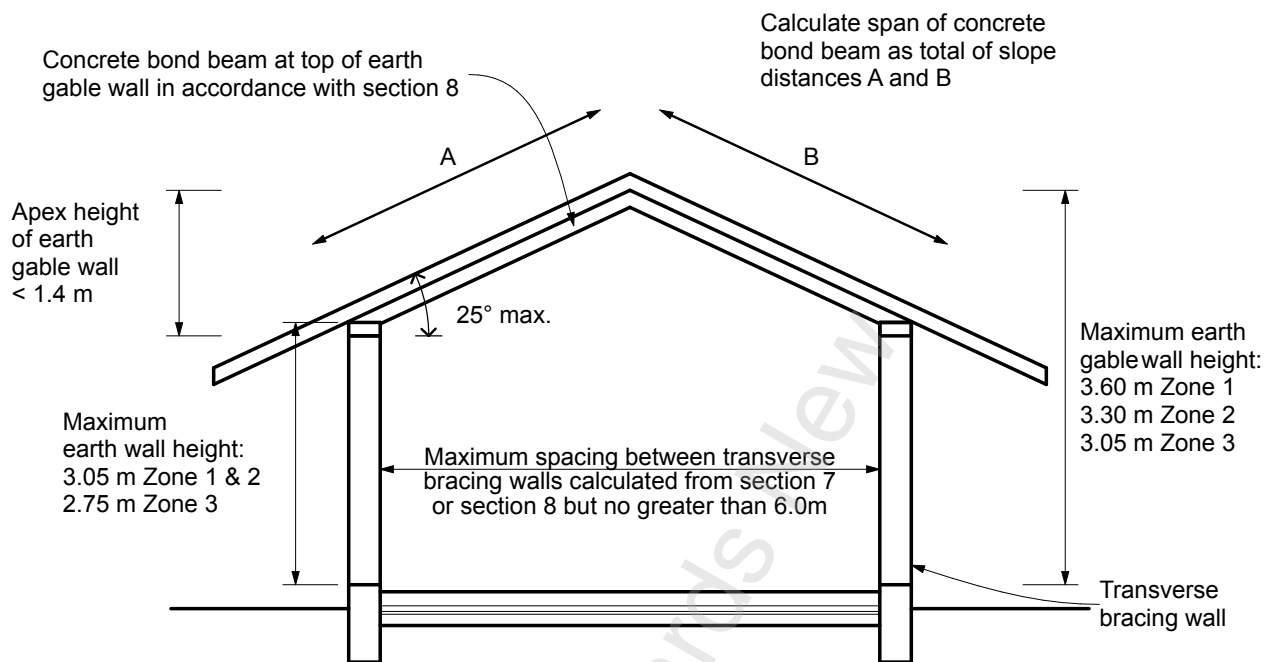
Concrete bond beam at top of earth gable wall without ceiling diaphragm and apex height of earth wall < 1.4 m
